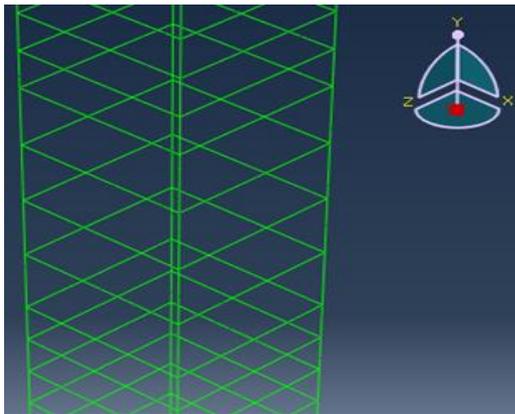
Undeformed shape of the reinforcement embedded in specimen R60Am18
